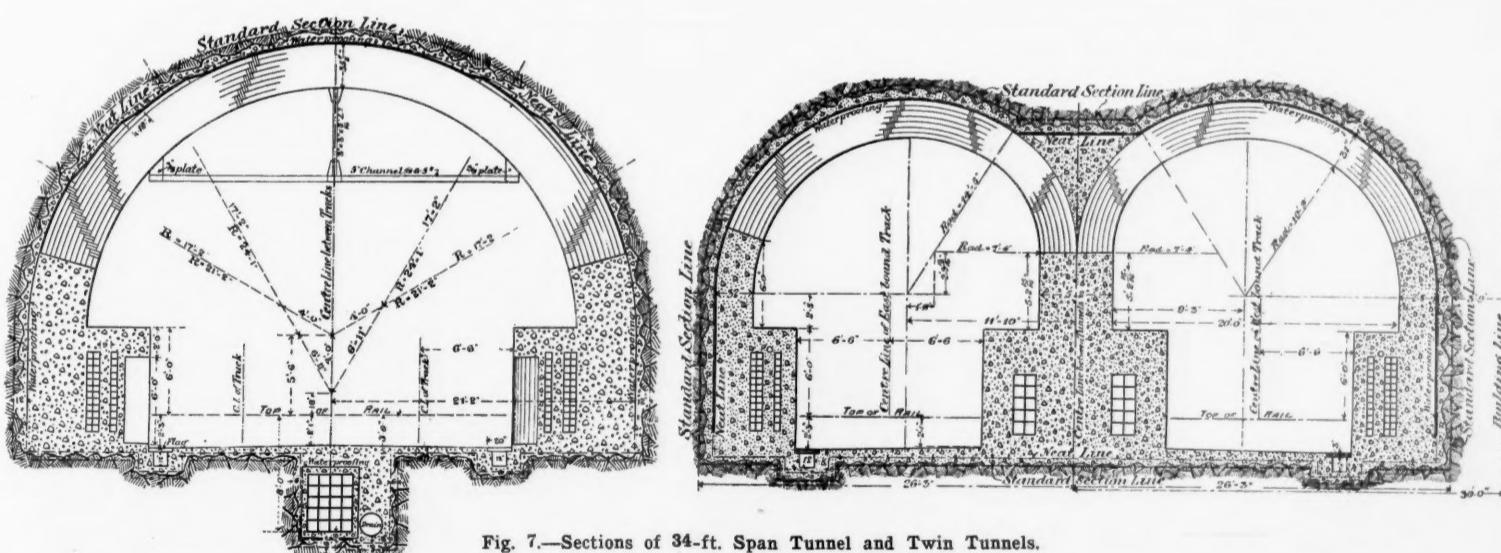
Sections of 34-ft. Span Tunnel and Twin Tunnels.
